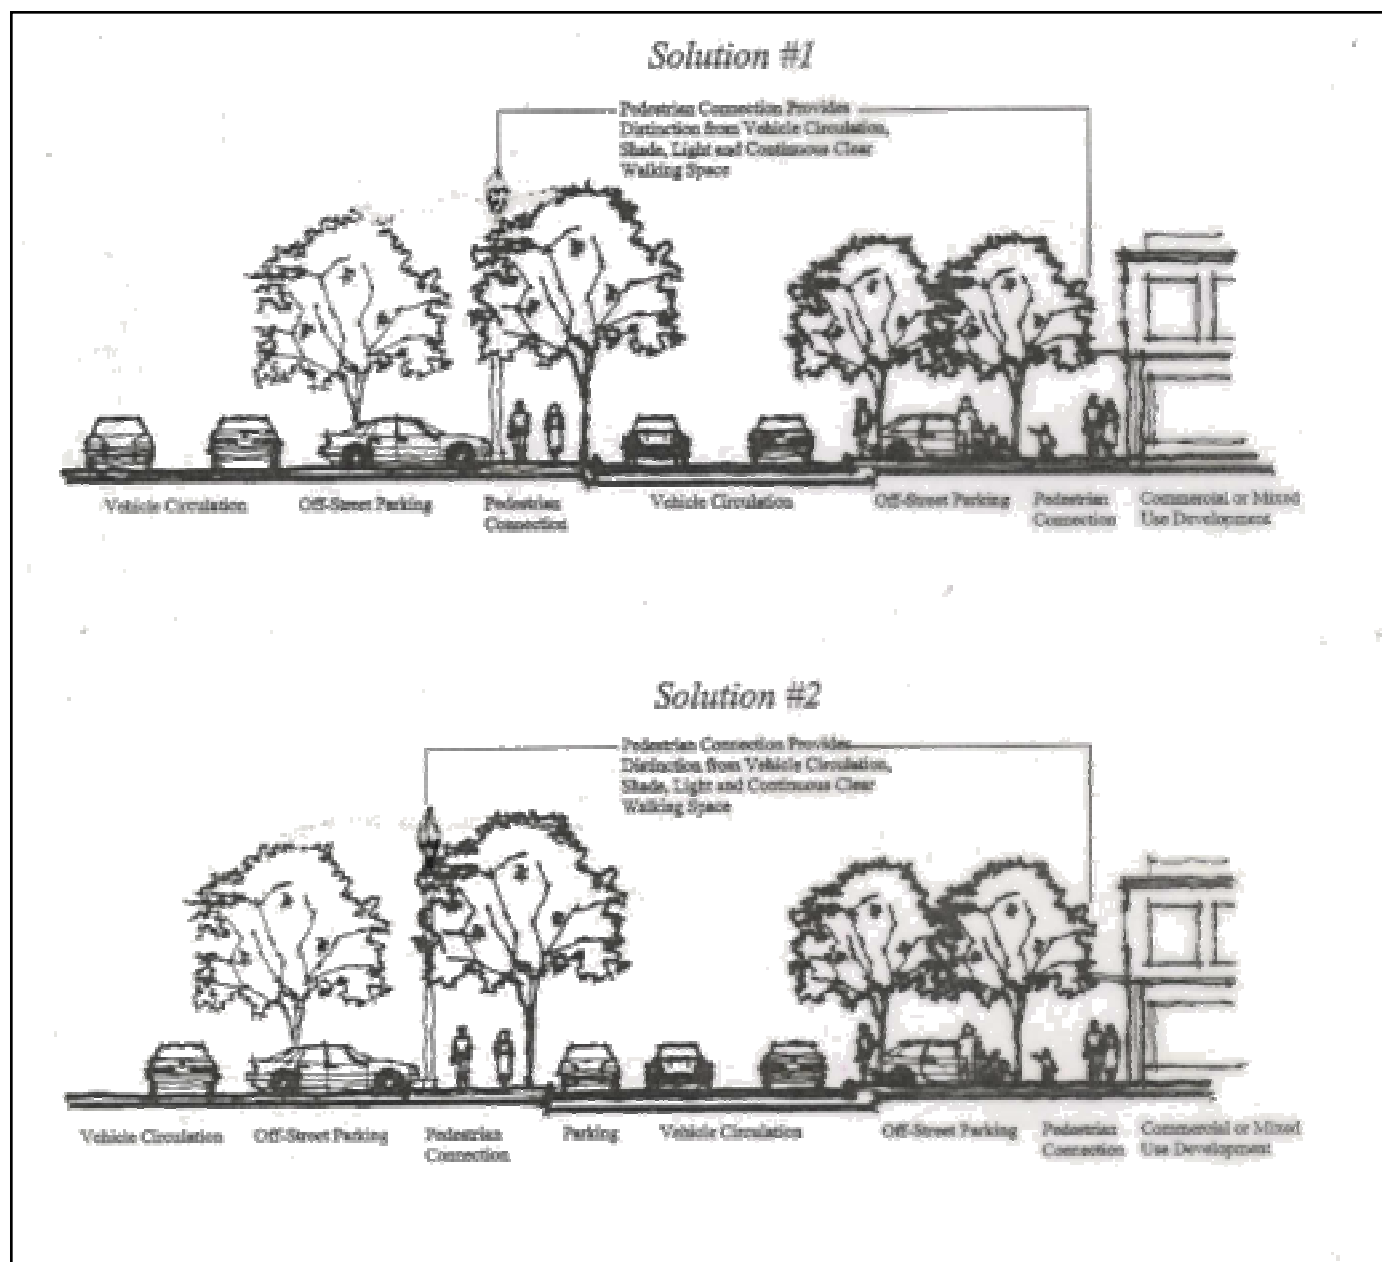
Examples of shopping streets used to meet the block layout standards (page 56) and the building orientation standards on page 58 when a full street connection cannot be met. Note: The above driveways do not have to extend through to Highway 33, provided that a pedestrian connection is made to the required sidewalk or multi-use path.
